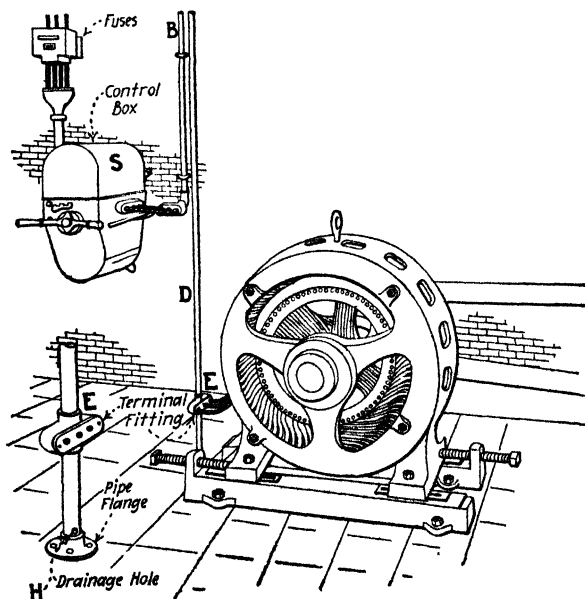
Conduit installation for a motor as it should be made in damp places.
